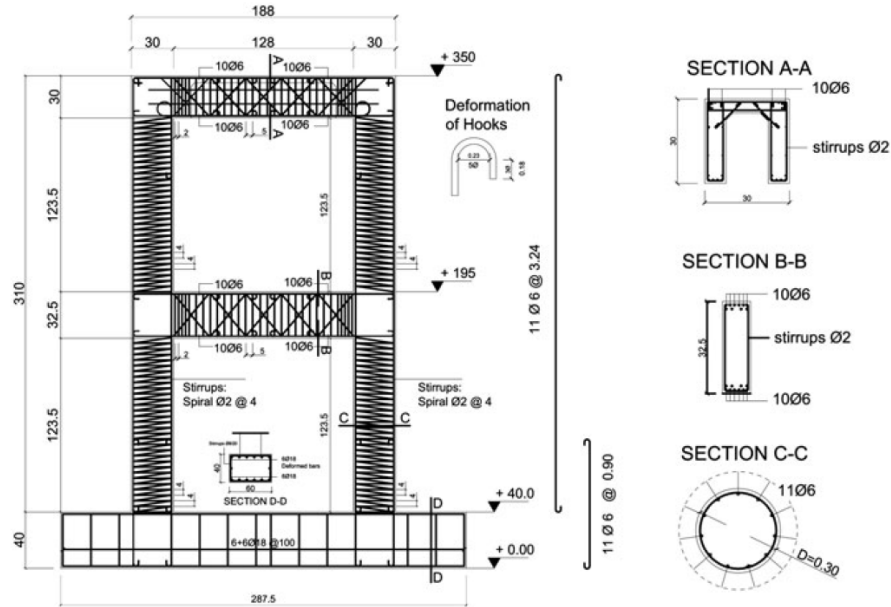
Reinforcement layout and cross section of Pier 12 (dimensions in cm)
